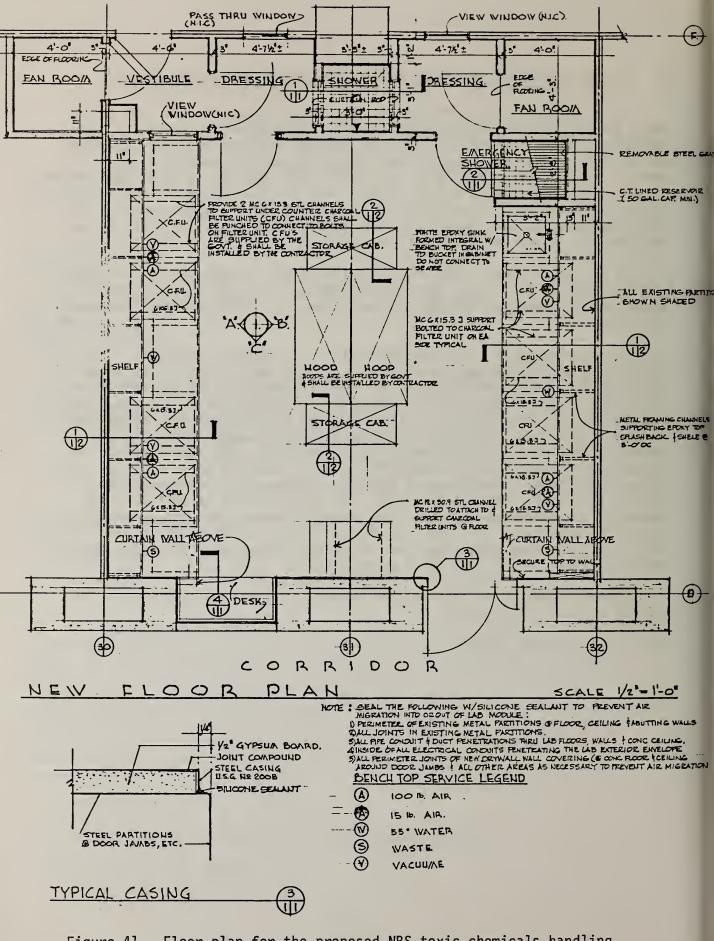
Floor plan for the proposed NBS toxic chemicals handling laboratory. 174
